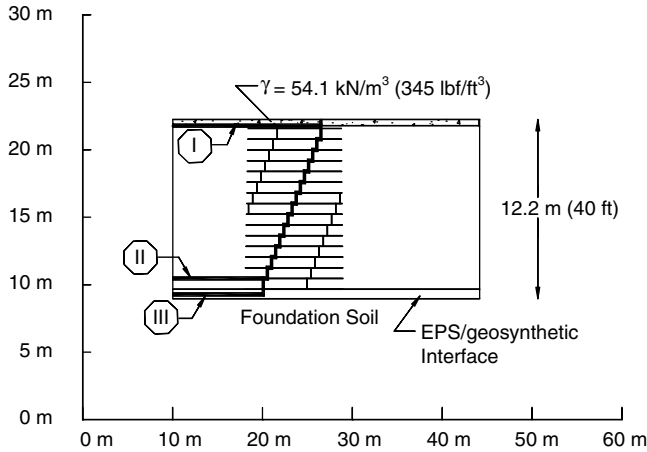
Typical cross section used in seismic internal slope stability analyses for vertical embankments with the three applicable failure modes.
